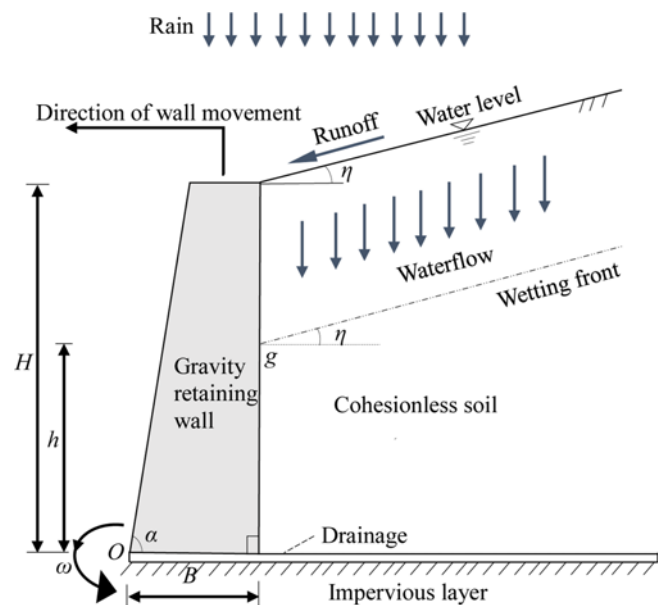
Rainfall Infiltration Model of a Gravity Retaining Wall with Cohesionless Soil
